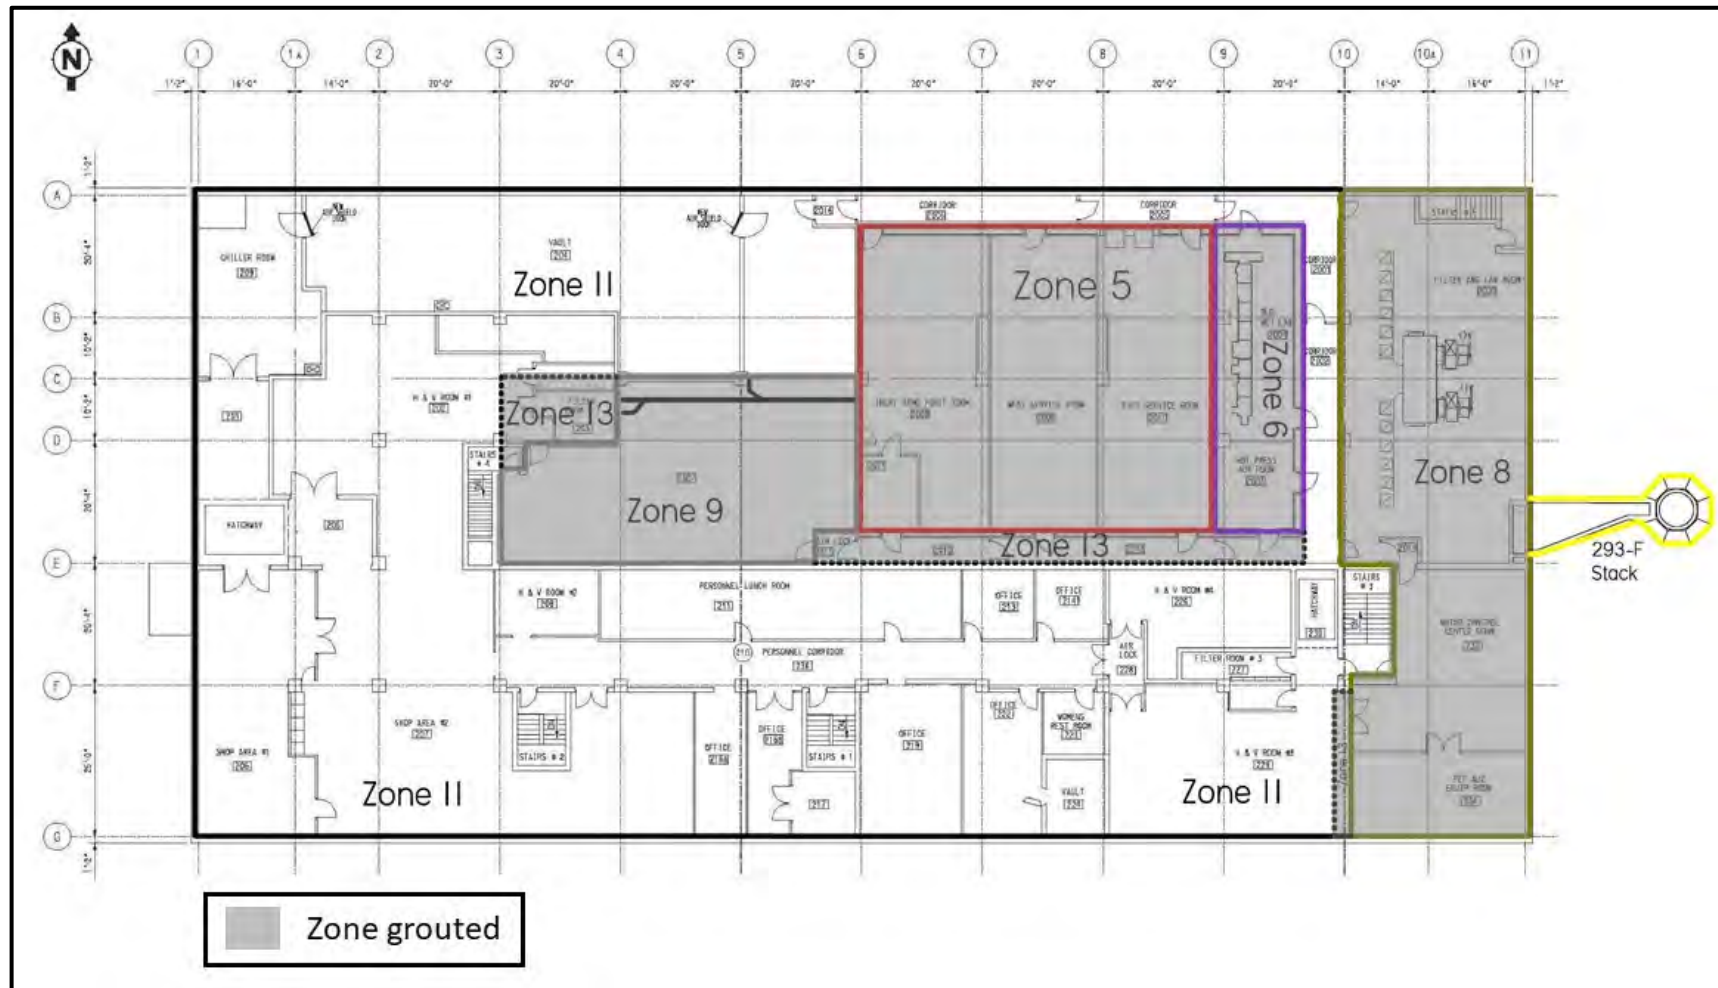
Alternative A-2 – ISD of First and Second Level Process Areas /Engineered Roof (Second Level View)
